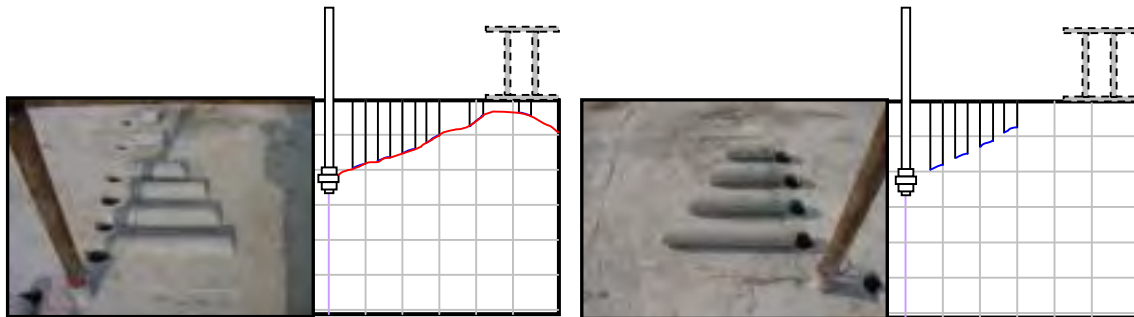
(b) Typical Internal Crack Profile in Specimen (T1)
